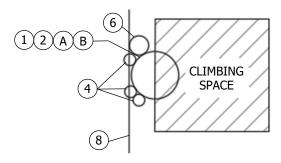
THROUGH CONSTRUCTION SINGLE POWER RISER
